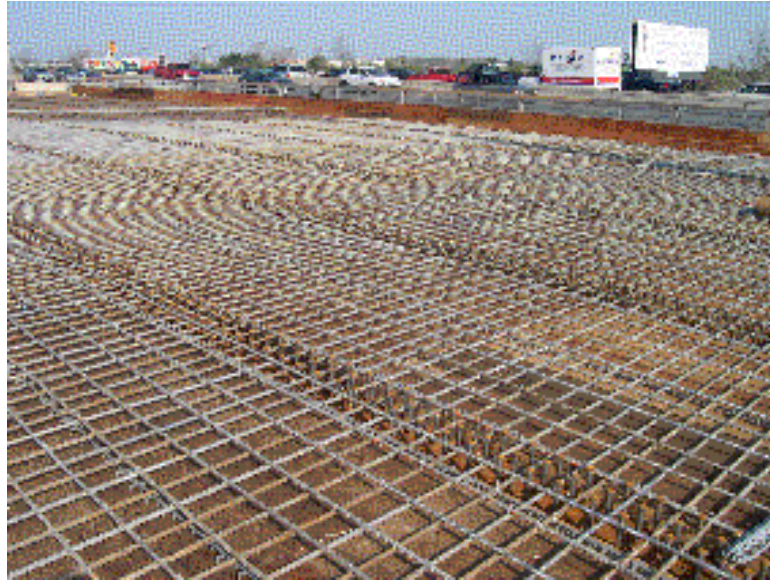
In-place galvanized reinforcement on the Frontage Road Bridge deck.
